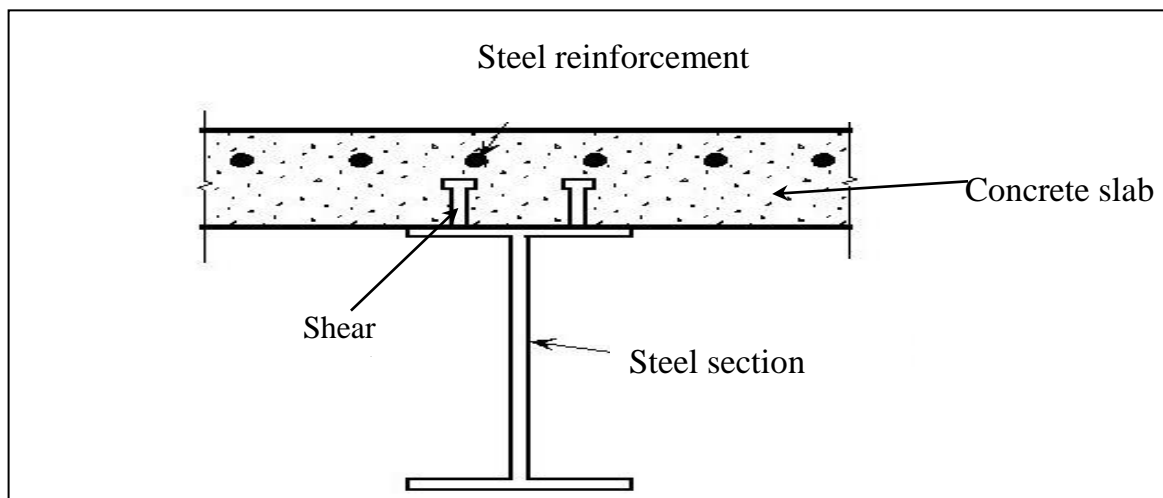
Typical composite beam consist of steel section and concrete slab.
